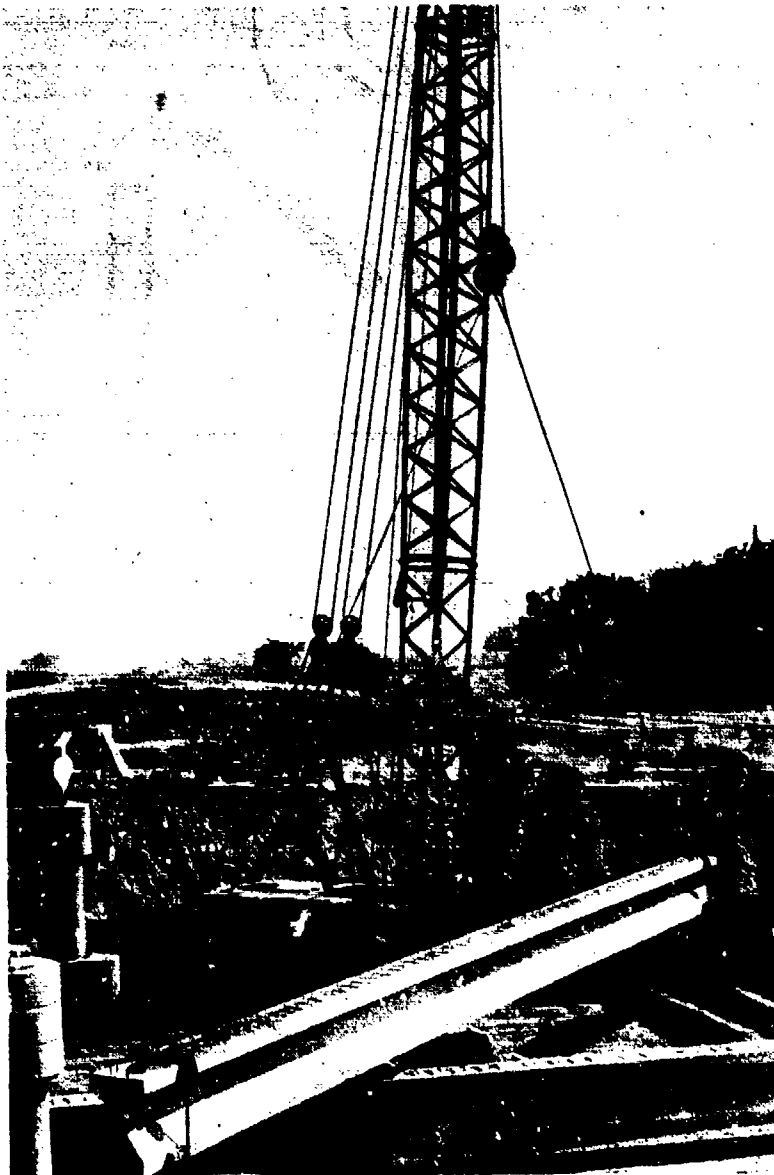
Girder lifted by slings attached to inserts at ends (Courtesy of American Concrete Institute)
